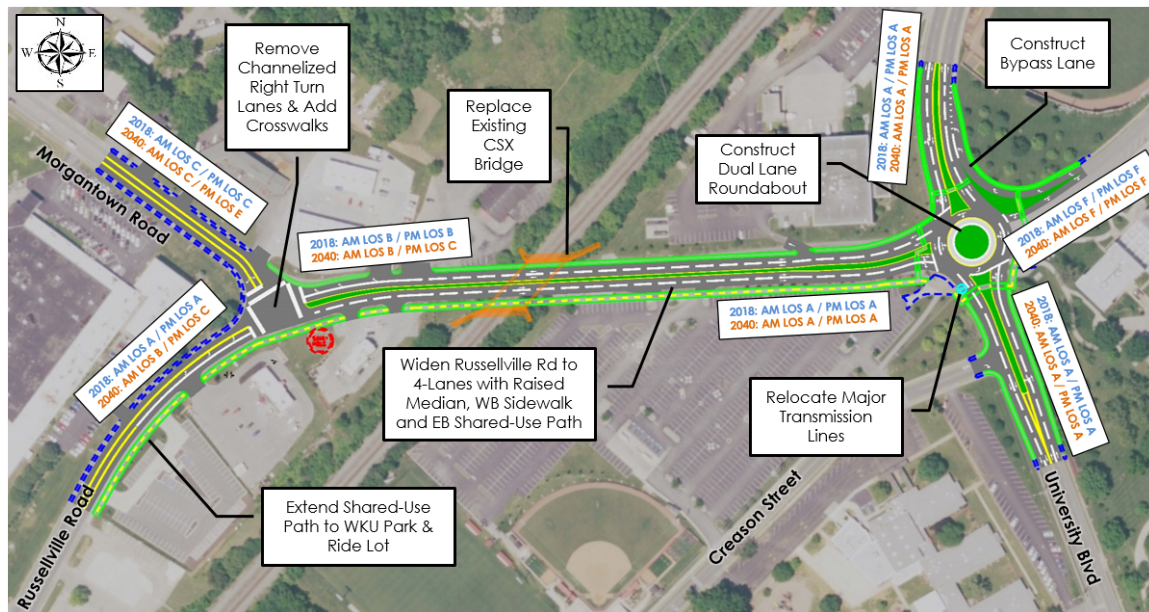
Widen Russellville Road with Roundabout at University Boulevard
